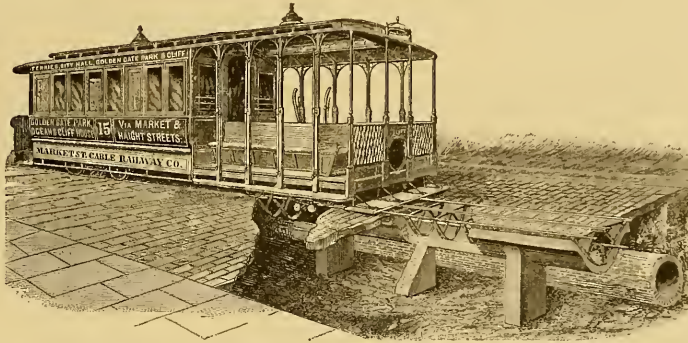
SECTION OF ROAD BED, SHOWING FOUNDATION, PIERS, TUBE, PATENT CAR, ETC.
